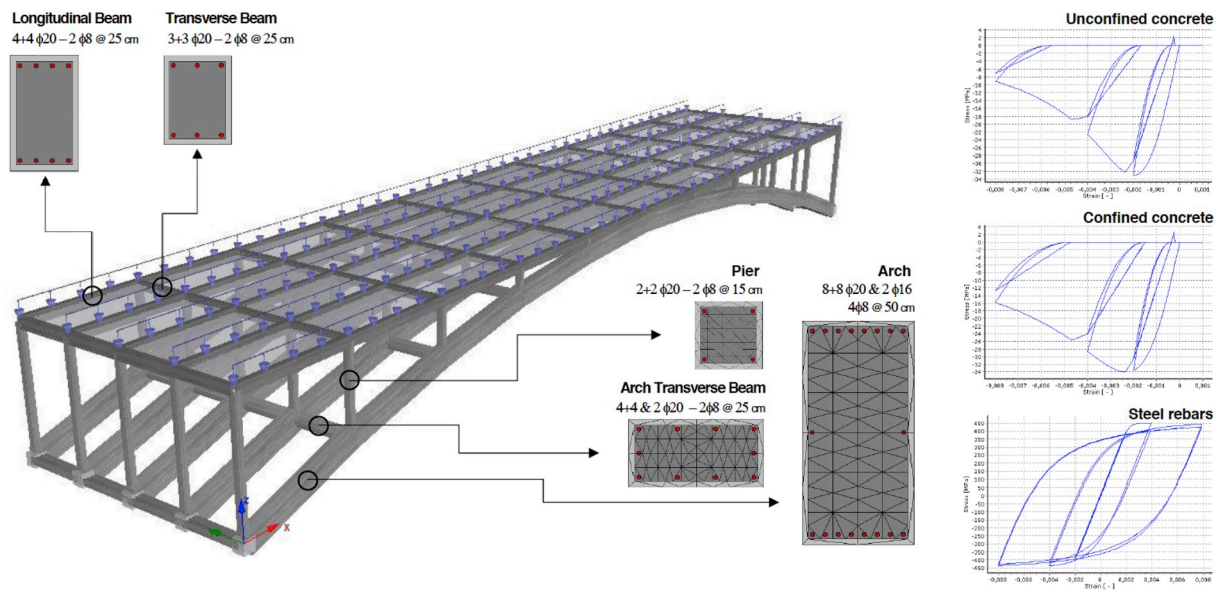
RC arch bridge FE model and adopted constitutive laws for unconfined - confined concrete and steel rebars.
